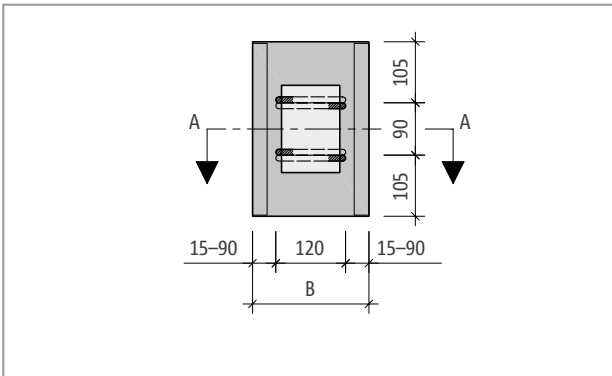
Schöck Sconnex® type W-N-VH: Product plan view; positioning of shear force bars
